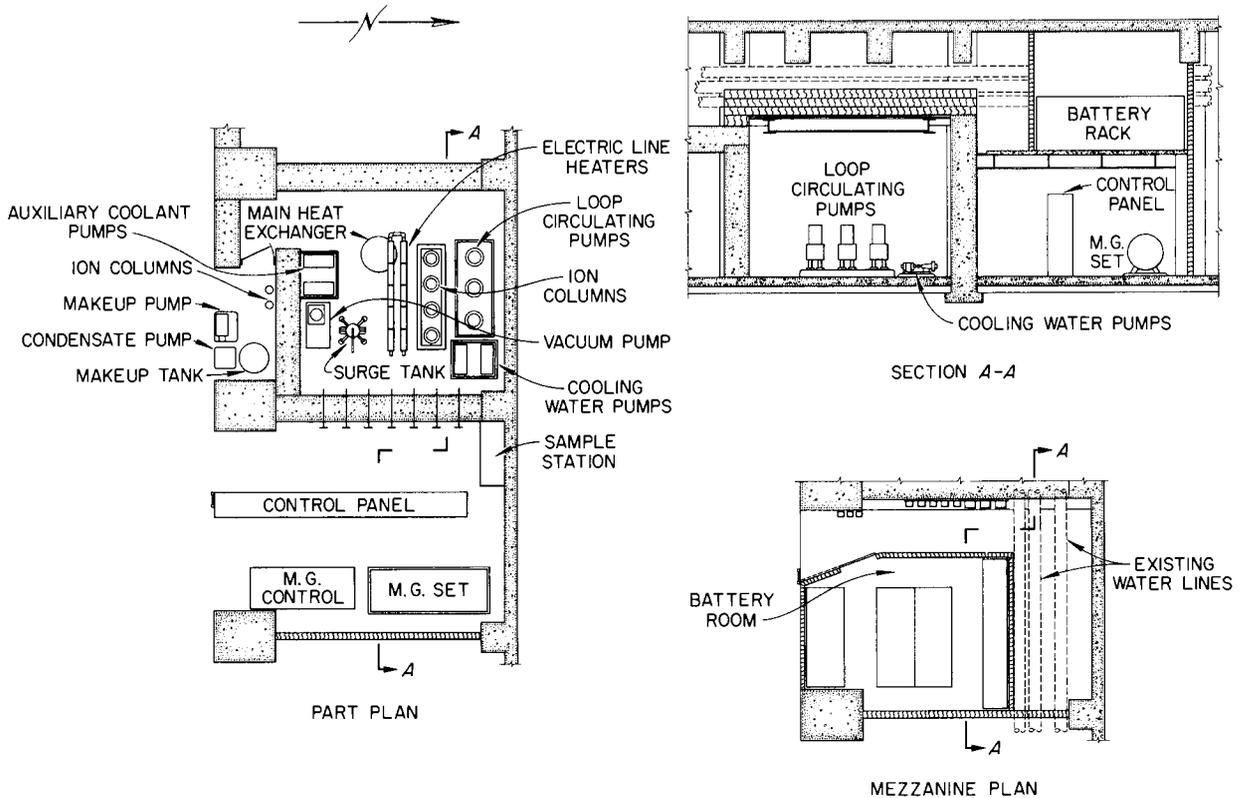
Equipment Arrangement Plan and Section of Pressurized-Water In-Pile Loop.
